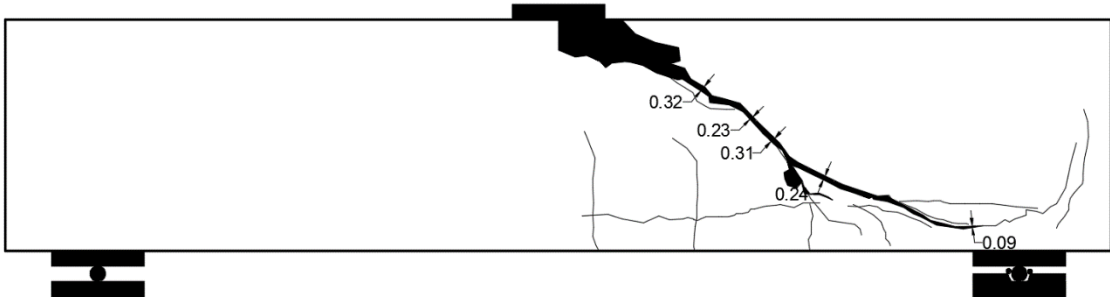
Crack pattern at failure for SNFRC 0.5% beam #29
